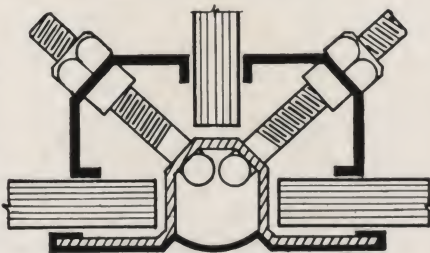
DETAIL OF CONSTRUCTION OF NO. 80 GLASS SETTING
